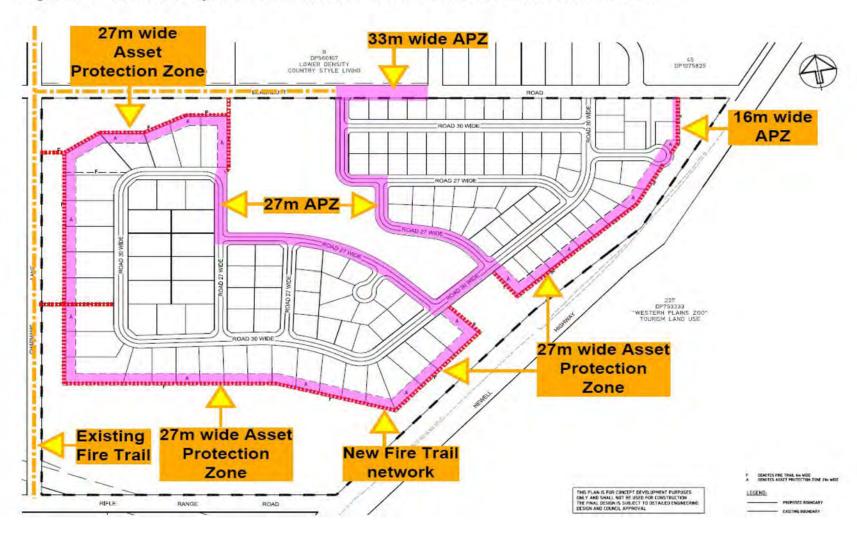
Indicative layout of recommended Asset Protection Zones and Fire Trails.
